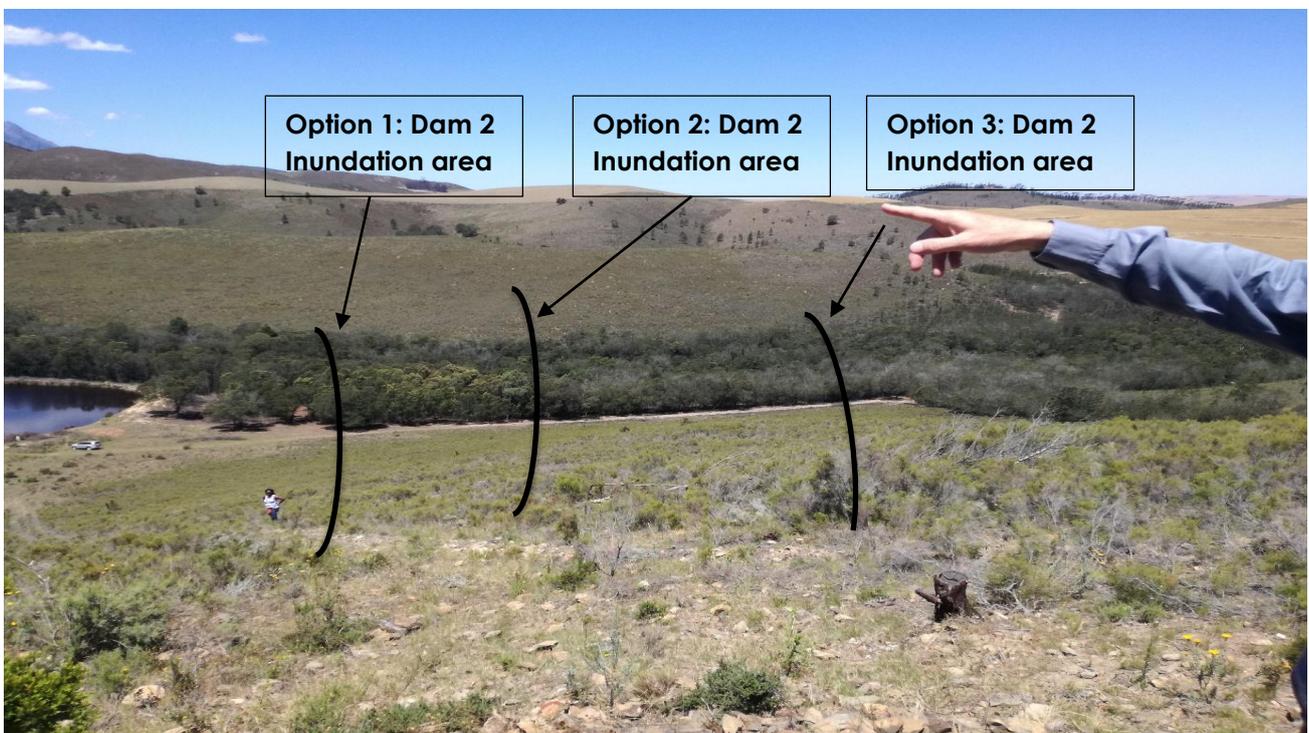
Hill side view of proposed options for Dam 2 extensions and inundation areas
